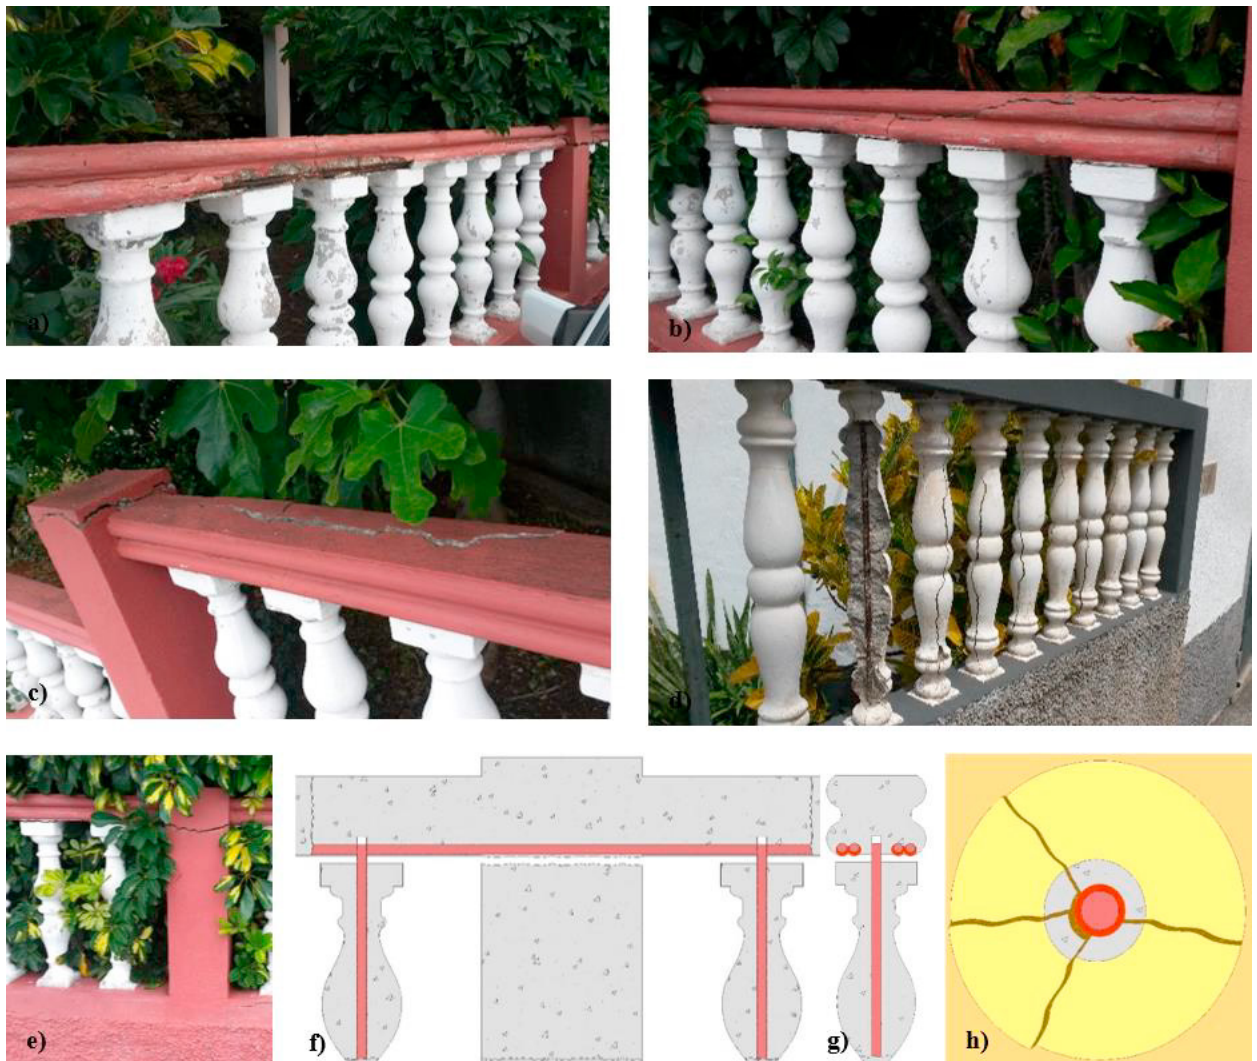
Concrete fence: a) Element overview with advanced corrosion at the bottom of the beam; b) Cracking of the beam with separation between columns and beam; c) Detail of the cracking extension; d) Advanced corrosion in the columns; e) Detail of cracking due to corrosion of the reinforced beam; f), g) Schemes of the elements and the effect of corrosion on the beam; h) Scheme of the column corrosion effect.
